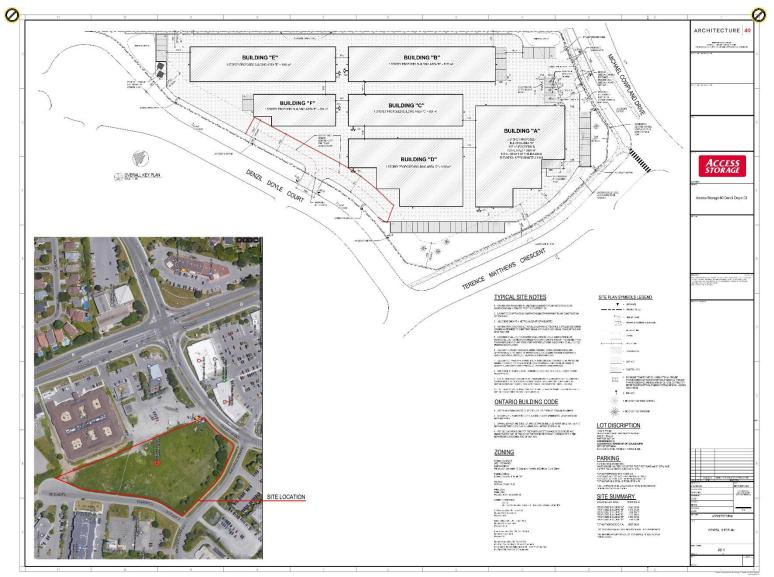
60 Denzil Doyle Court - Site Plan (prepared by Architecture 49, dated December 12, 2022)
